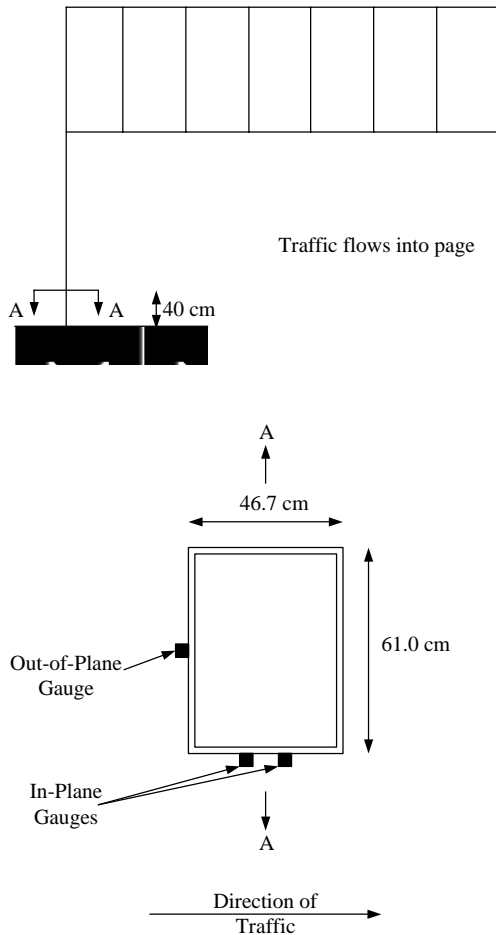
Gauge layout of IDOT Vierendeel VMS structure.
